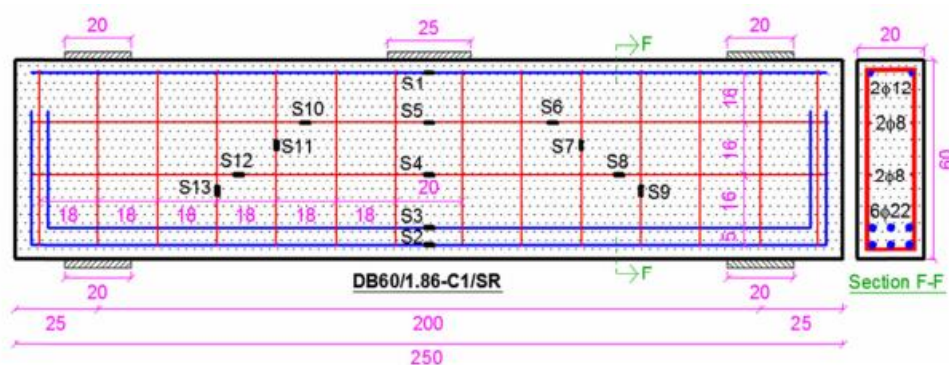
Reference Beam Detailing Configuration (Unit In cm Except for Reinforcement Unit In mm) (Rai, 2021)
